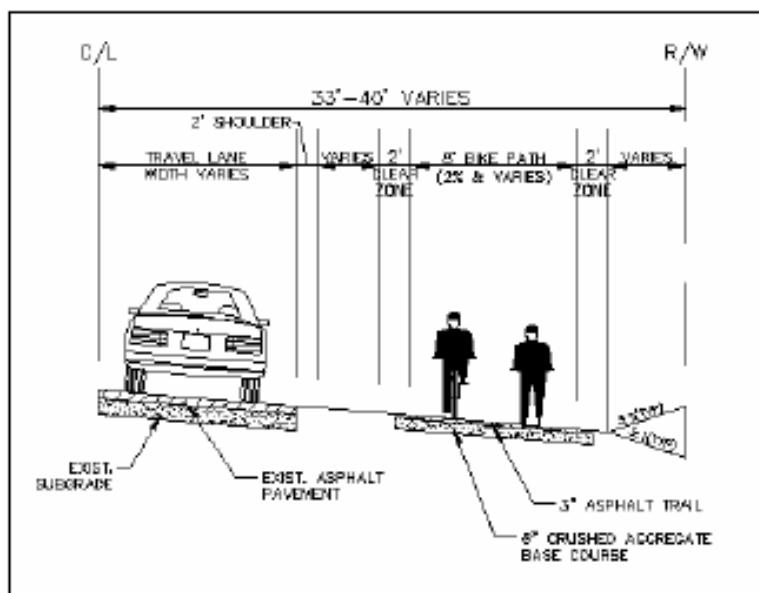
Typical Bike Lane Detail (road without curb and gutter)
